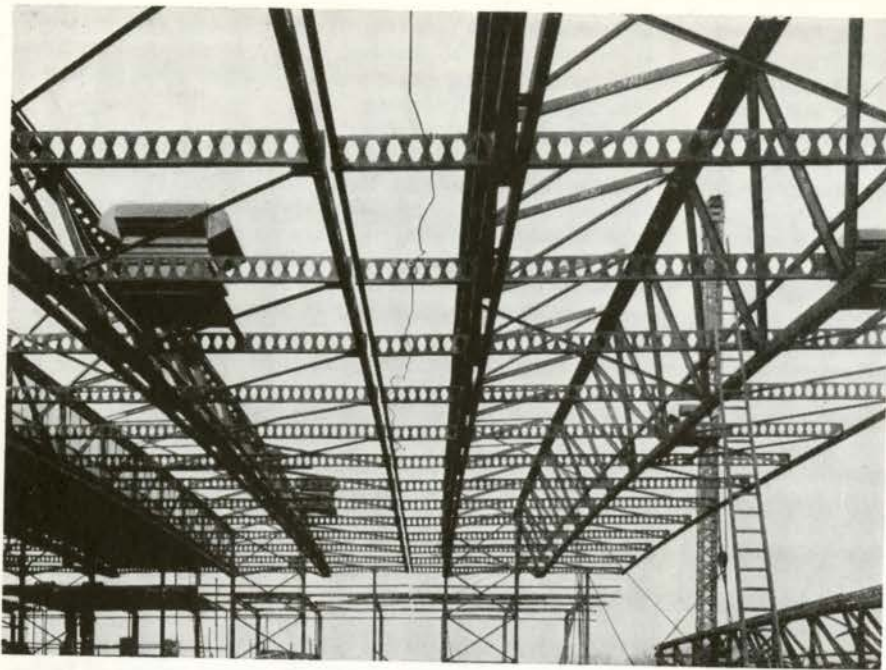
Hindhaugh Street Flats, Newcastle upon Tyne. Designed by E. Czeiler as a three-dimensional frame, the floors acting as horizontal girders for lateral stiffness.
